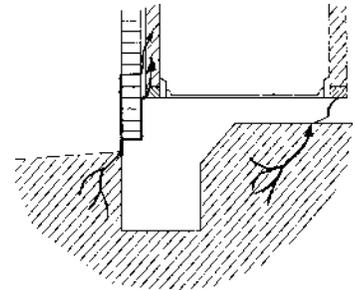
Monolithic slab—tile floor (arrows indicate possible termite entry points).
